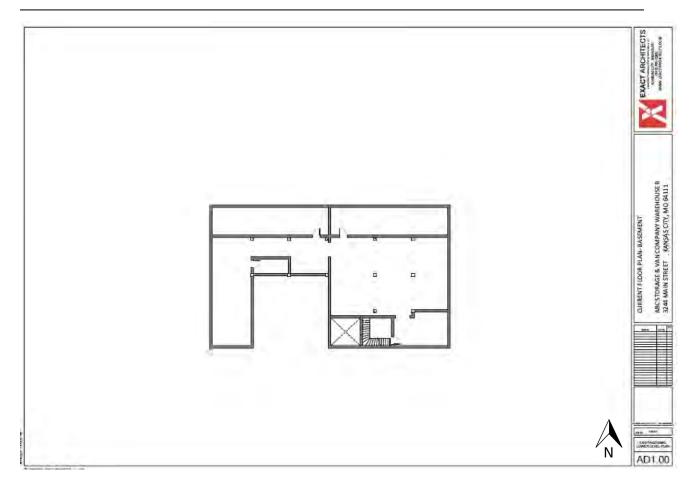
ABC Storage & Van Company Warehouse B current floor plan, basement Source: Exact Architects
